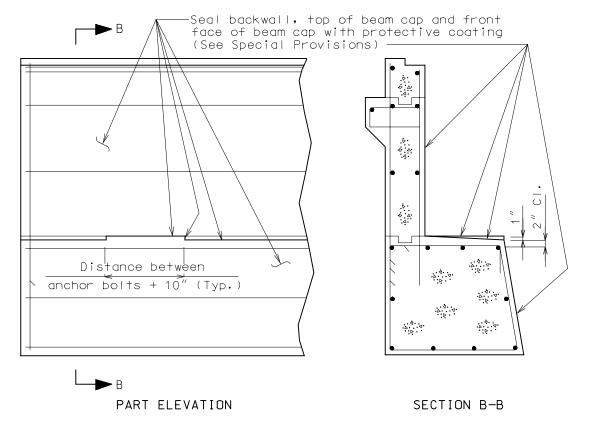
## DETAILS OF SUBSTRUCTURE PROTECTION FOR ALL EXPANSION DEVICES
